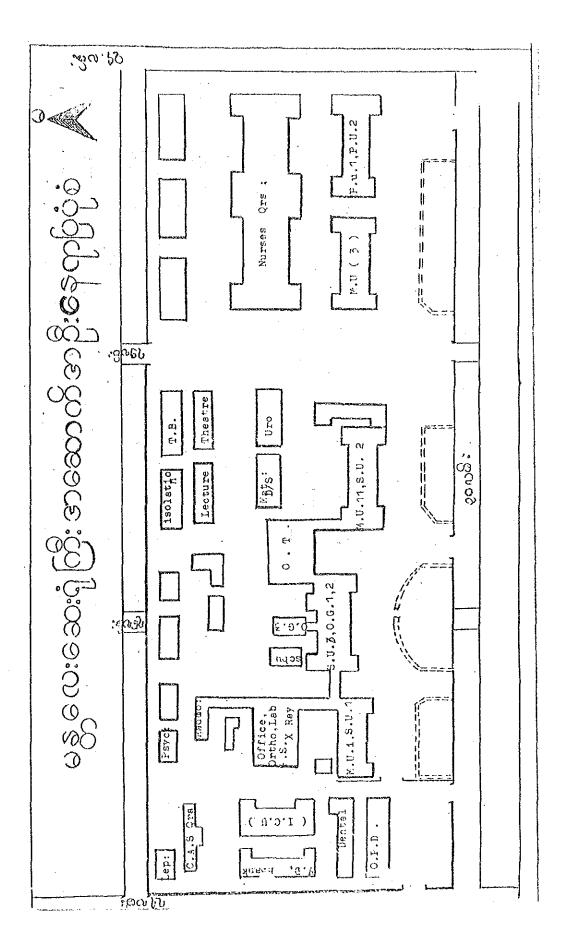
THE EXISTING BUILDINGS OF SITE
